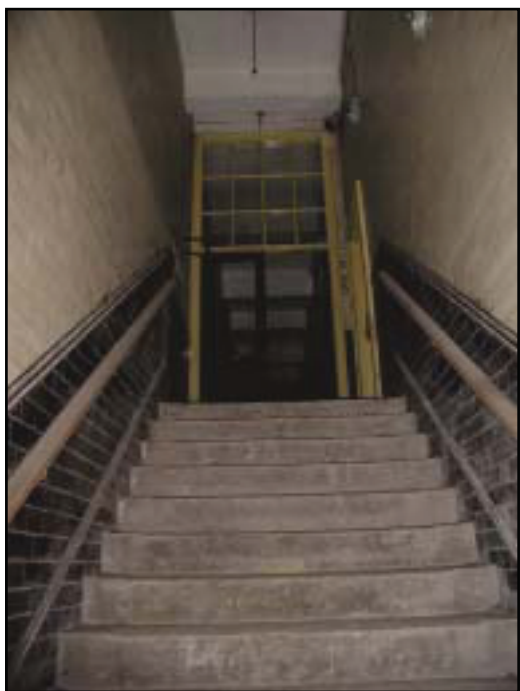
The Electric Lighting Station Gatehouse, View Up Main Stair from Ground to 1st Floor
